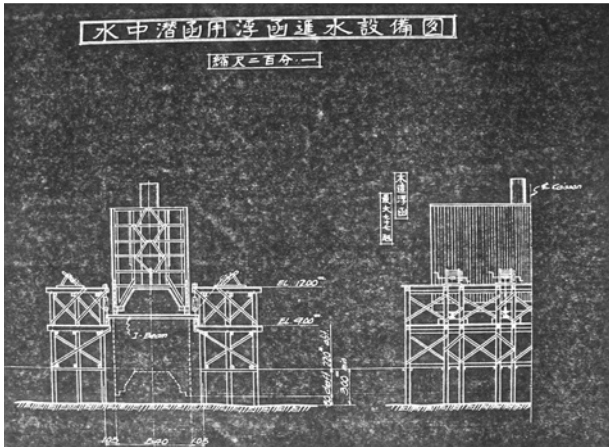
Launching Facilities for Caisson (Ise-Ohashi Bridge)
